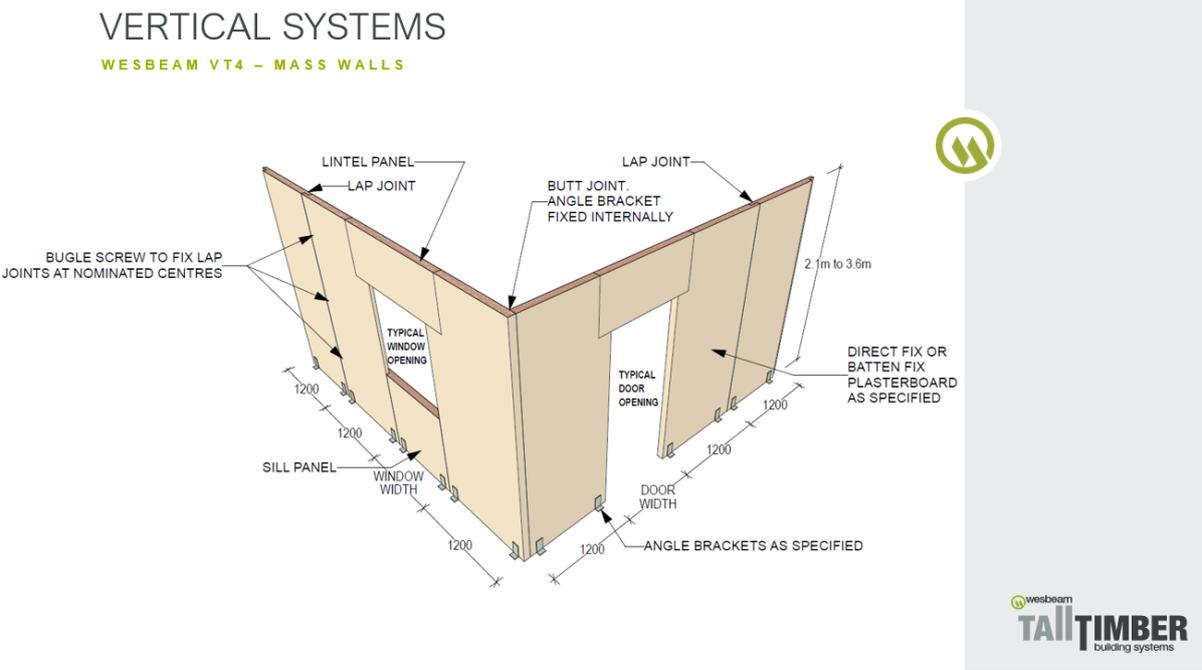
Wesbeam e-slab used as a mass wall panel (image: David Bylund Wesbeam)
